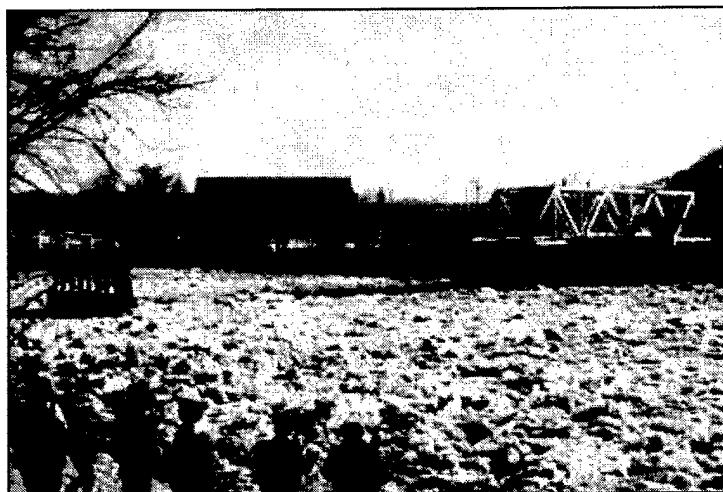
Failure of the Bridge Street Bridge, 26 January 1990, looking downstream.
